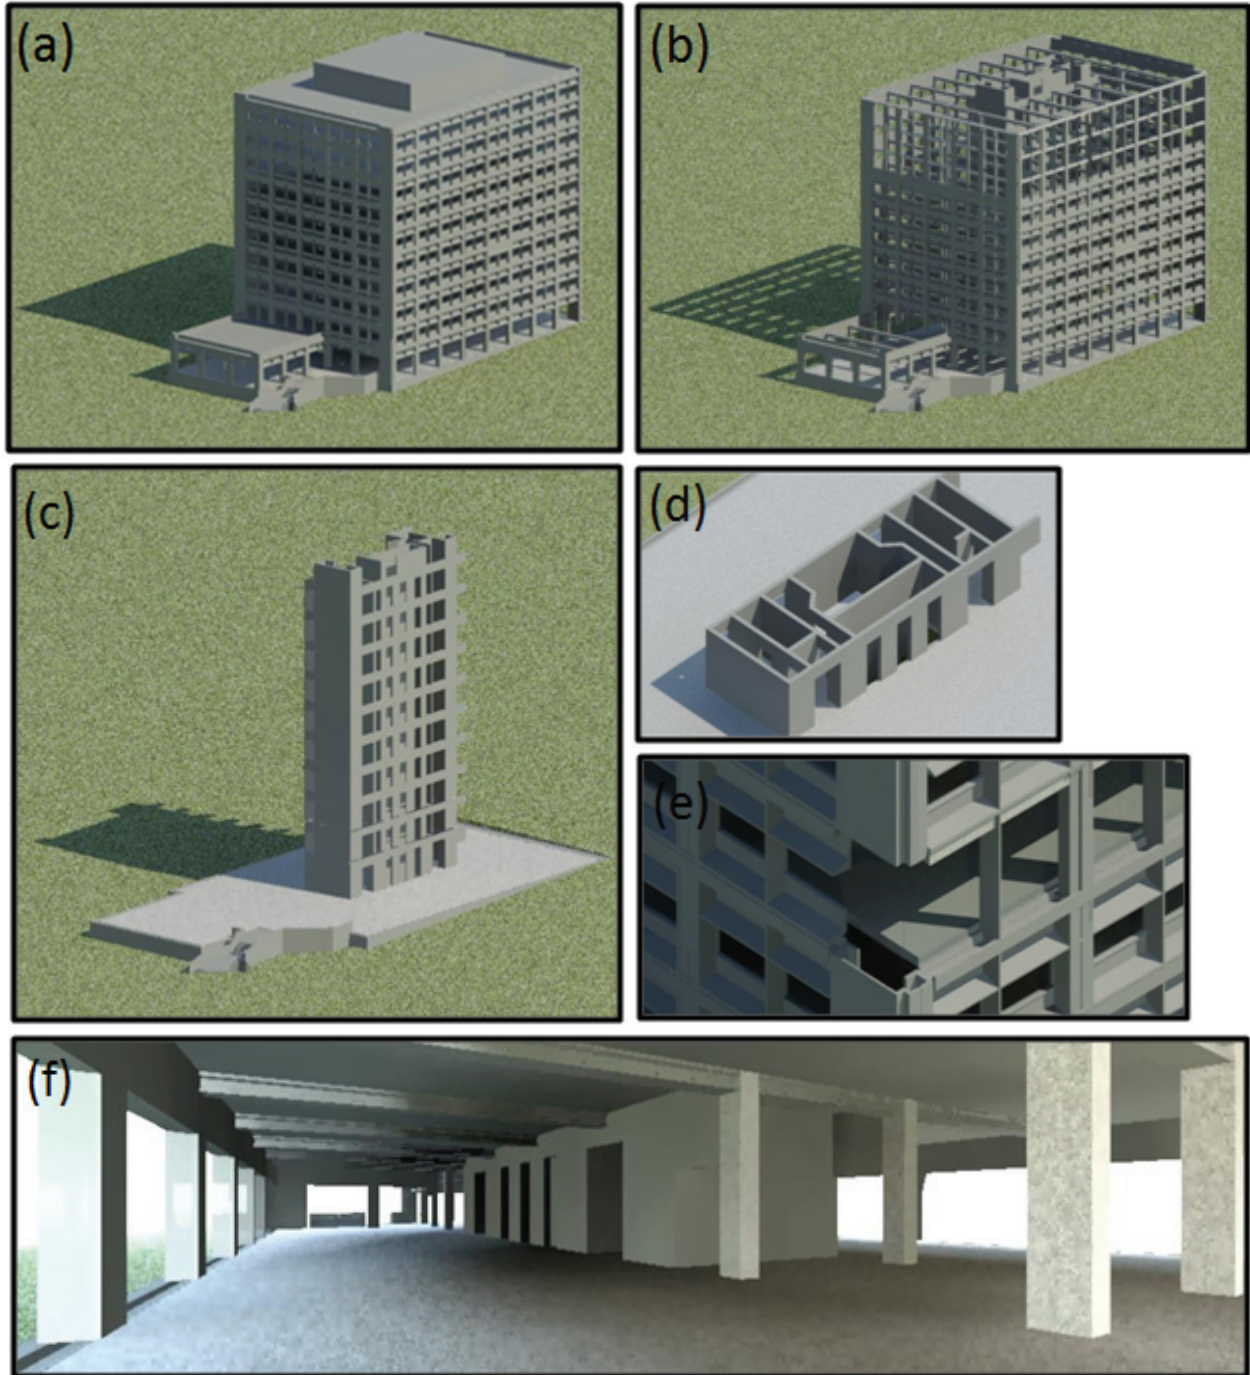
Renderings of the Walnut Creek building, including cut-away views showing: (a) the exterior facade; (b) structural framing; (c) core wall elevations; (d) core wall layout; (e) details of the precast cladding system; and (f) interior layout of a typical floor level.
